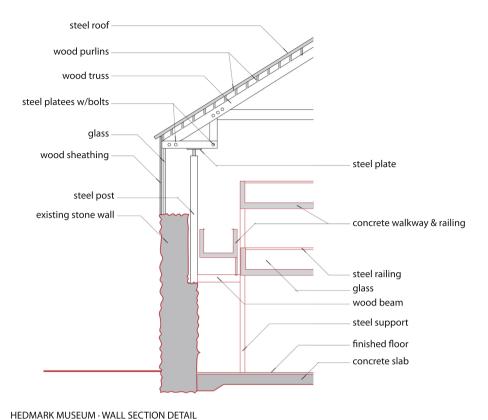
Wall section detail of construction materials and connections of the Hedmark Museum (Source: the authors)
